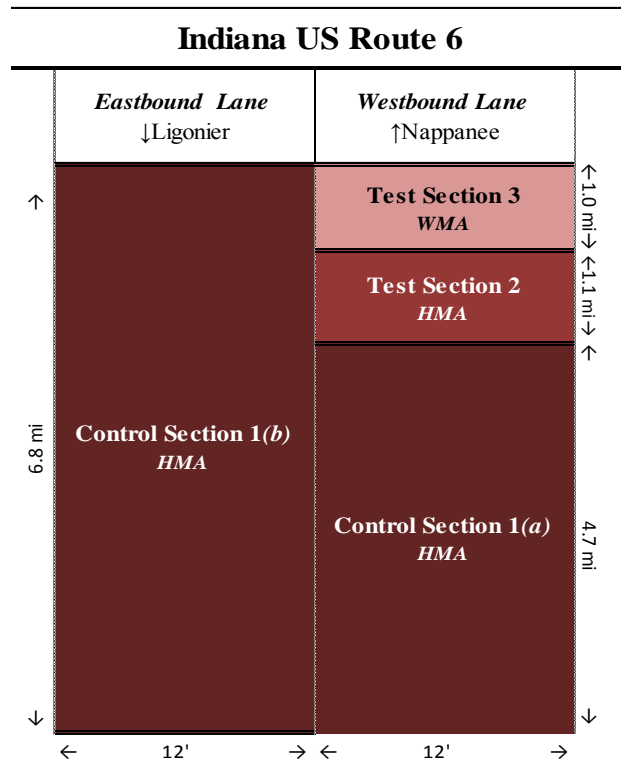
Plan View of Indiana Demonstration Project Test Sections [35]
